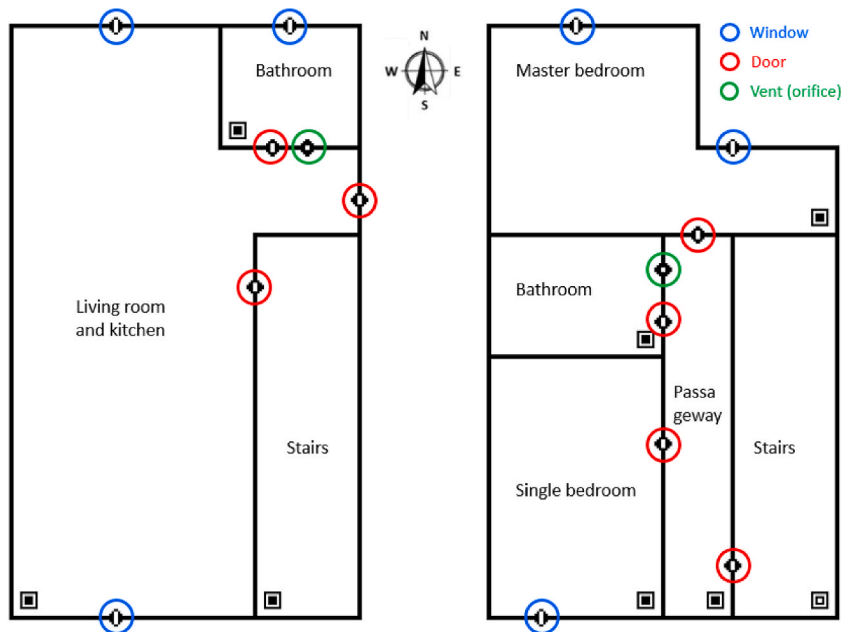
CONTAM model of the residential building, plan view of the first floor (left) and second floor (right).
